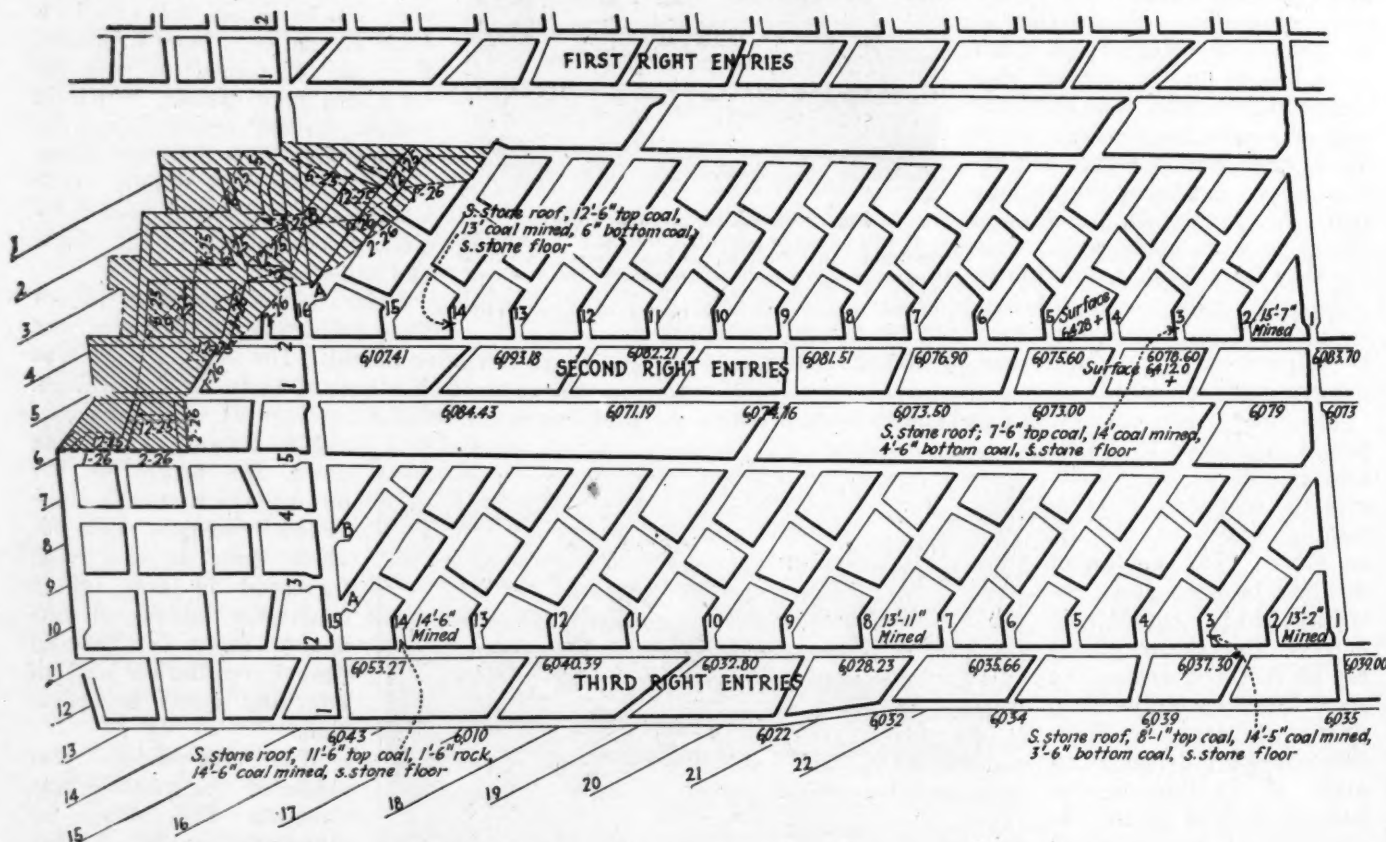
Typical Working in Castle Gate No. 2 Mine Showing Rooms with Pillars Being Removed
